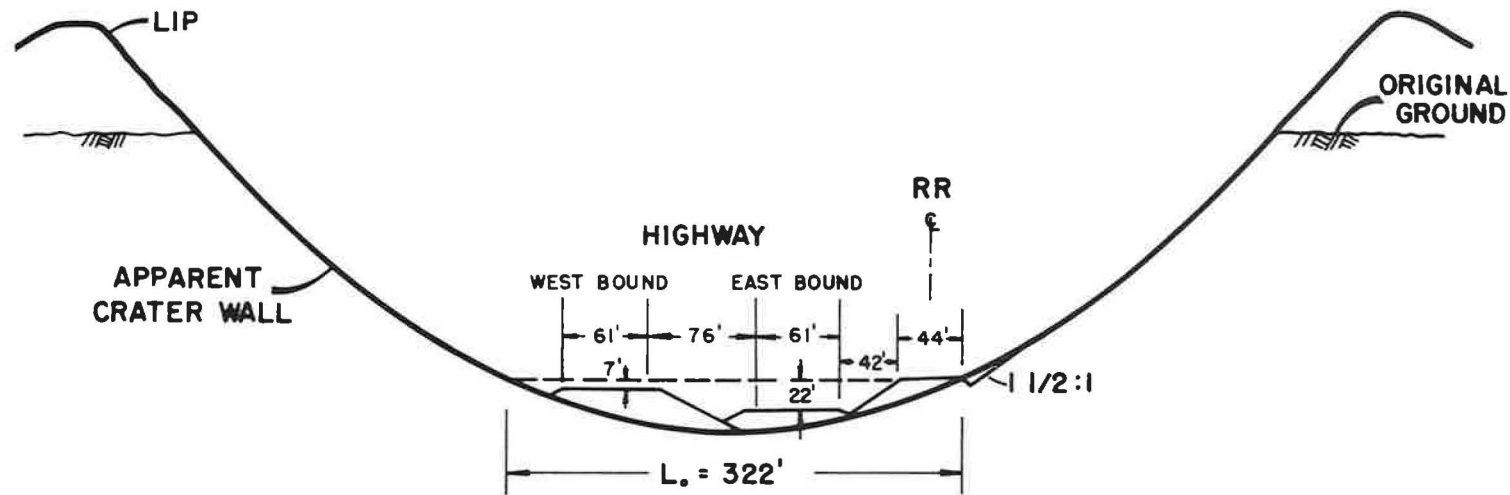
Typical cross section (50-kt crater) of roadway in nuclear excavation proposed for Project Carryall.
